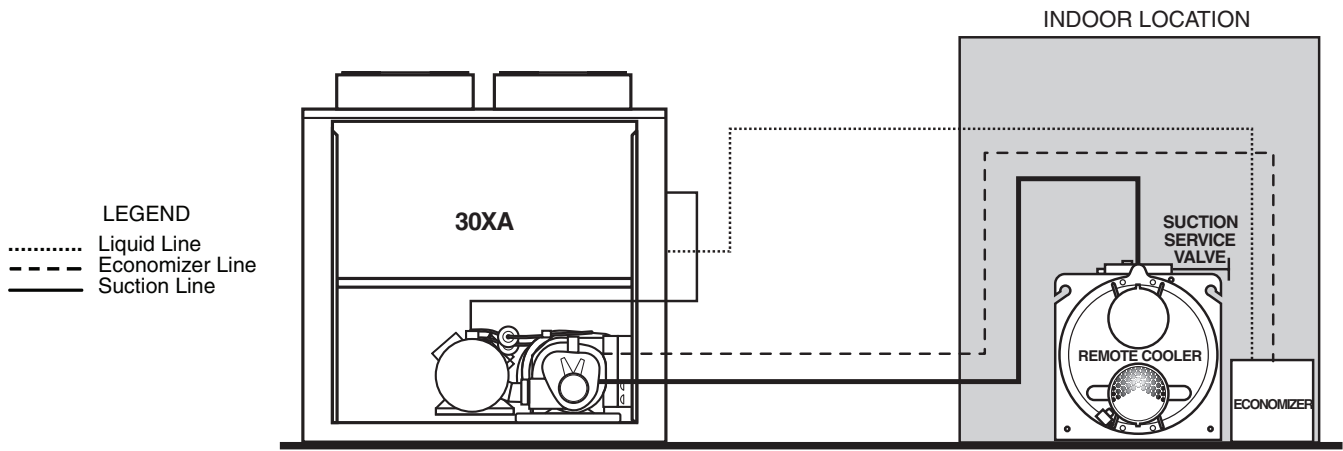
30XA Unit and Cooler Level, Piping Parallel (Single Circuit Shown)
